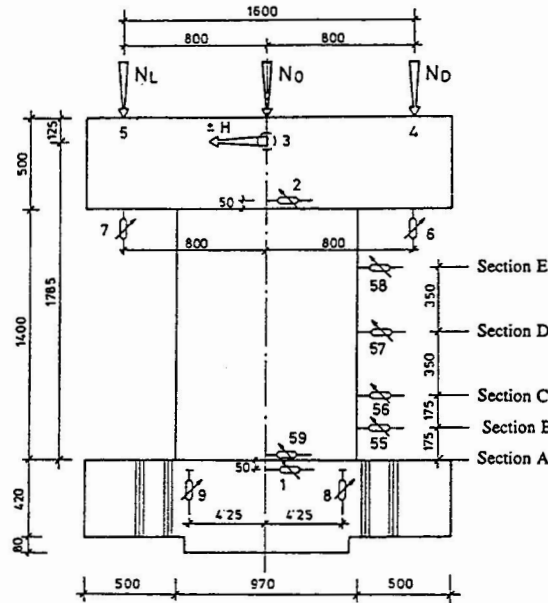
Instrumentation of walls with load cells and LVDT-s
